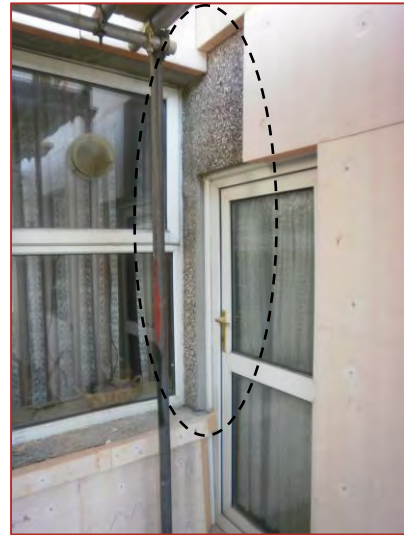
Early stages of the retrofitted EWI being installed at ground floor level
